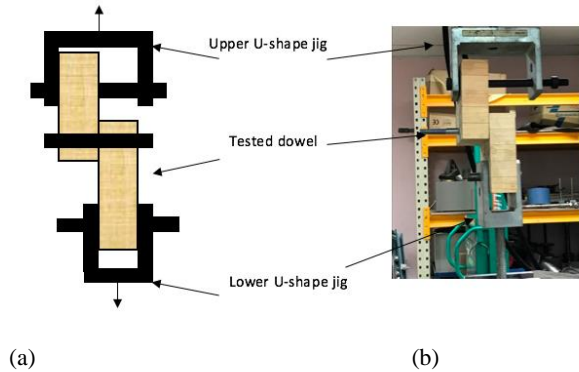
Single shear test set-up (a) sketch up (b) actual
